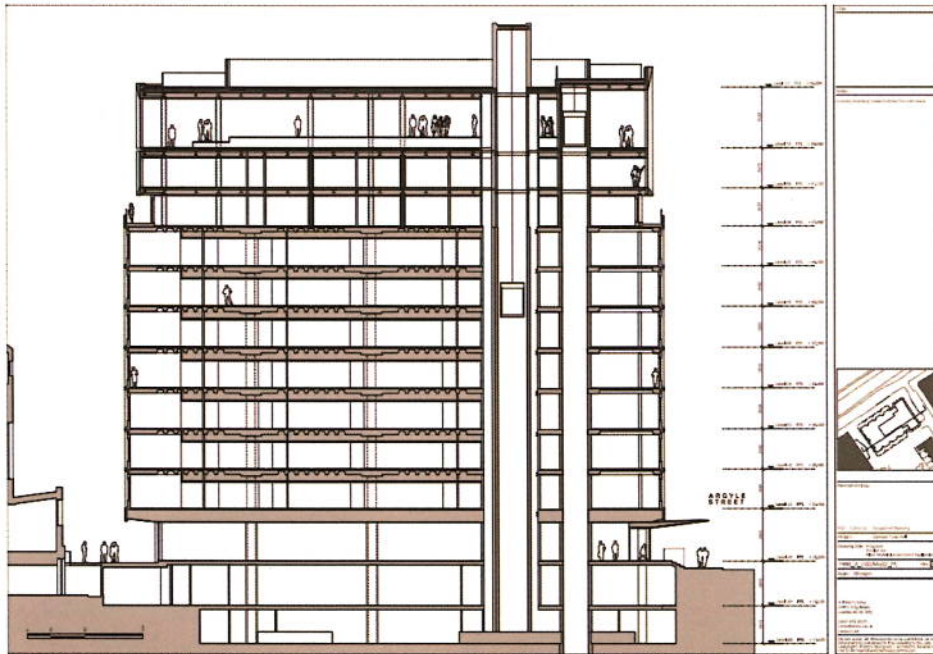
Section showing the hotel rooms on the Tonbridge Walk frontage (Ref: 2016/0410/P)
